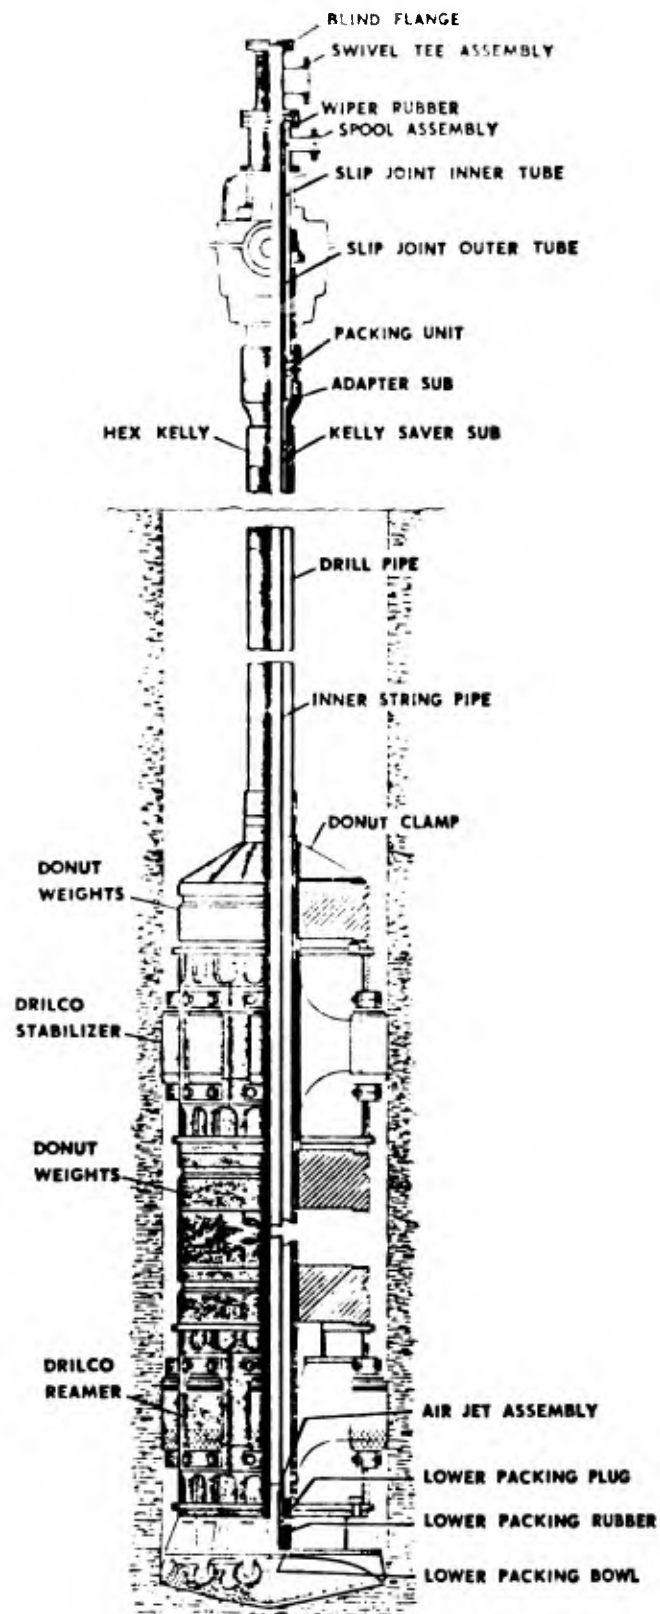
Typical drill-string assembly for drilling large-diameter shafts
